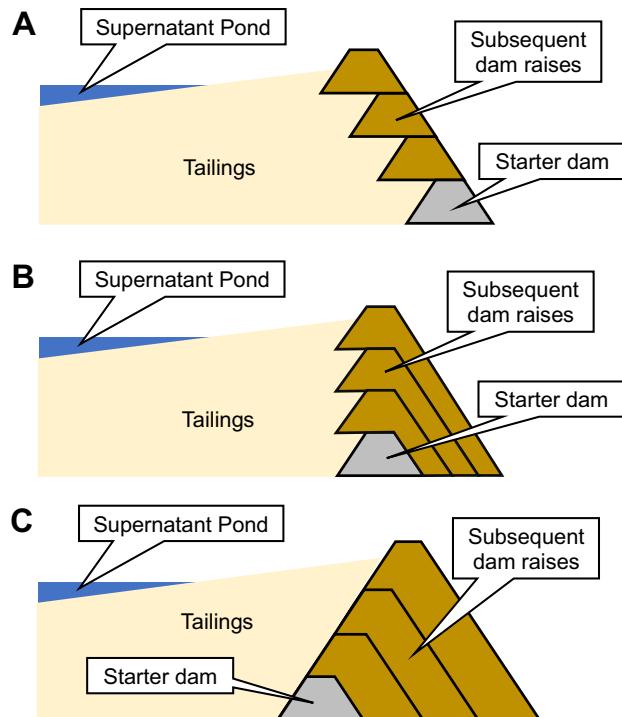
Schematic of tailings dam cross sections for different construction raises. a Upstream construction, b centreline construction, and c Downstream construction
